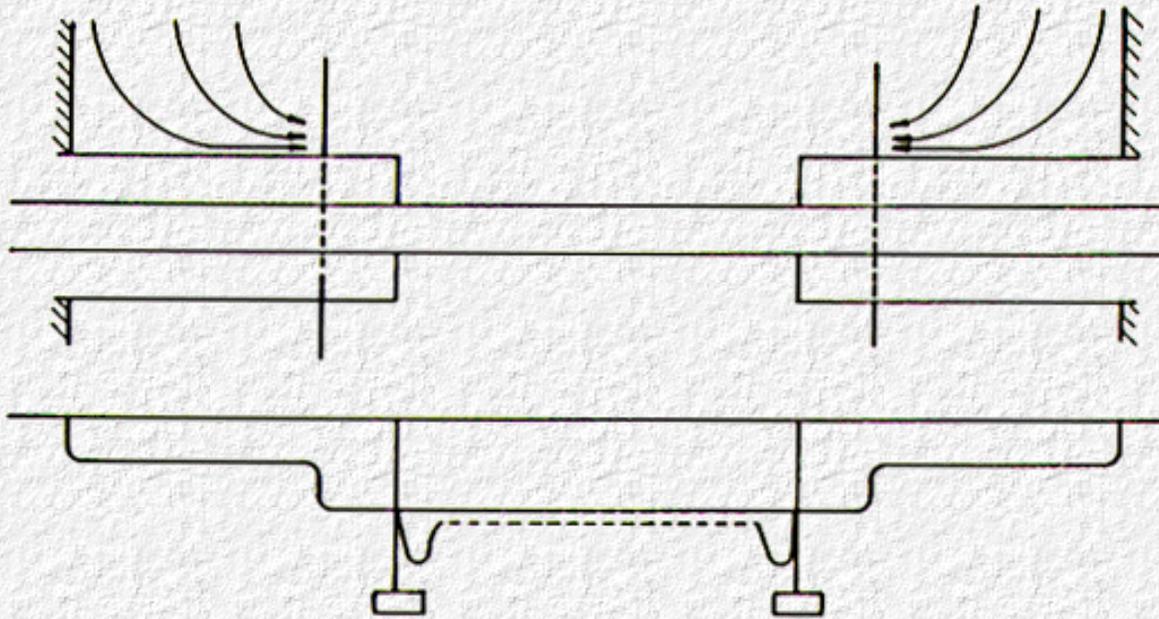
Bridge Abutment in Main Channel and Overbank Flow
